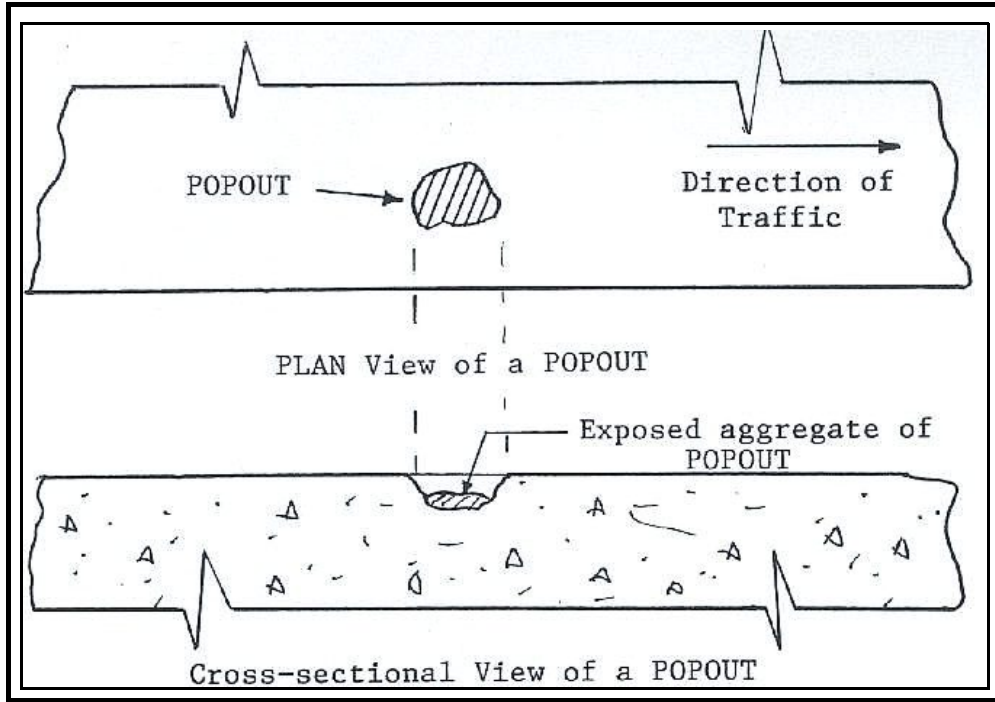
Popout in a Concrete Pavement, Plan and Cross-sectional Views
